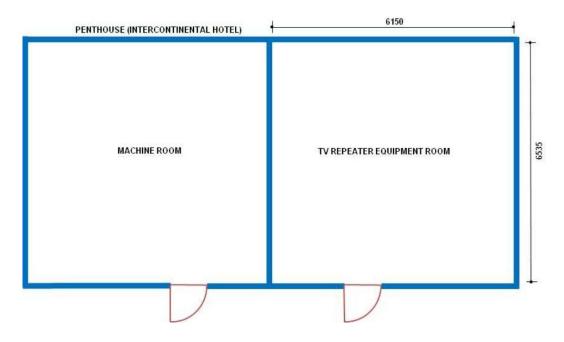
Kabul TV Repeater Site Plan
